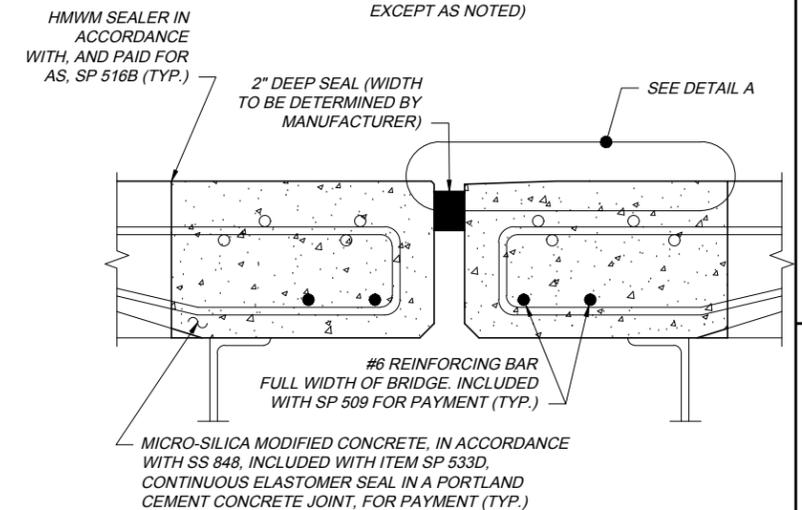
DETAIL AT ABUTMENT - EXISTING COMPRESSION SEAL
